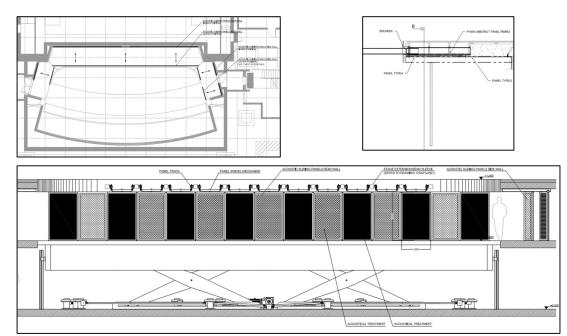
Design drawings of orchestra pit panel system in opera theater. Plan diagram (upper left), rear wall elevation (bottom), and detail of stage overhang panel (upper right).
